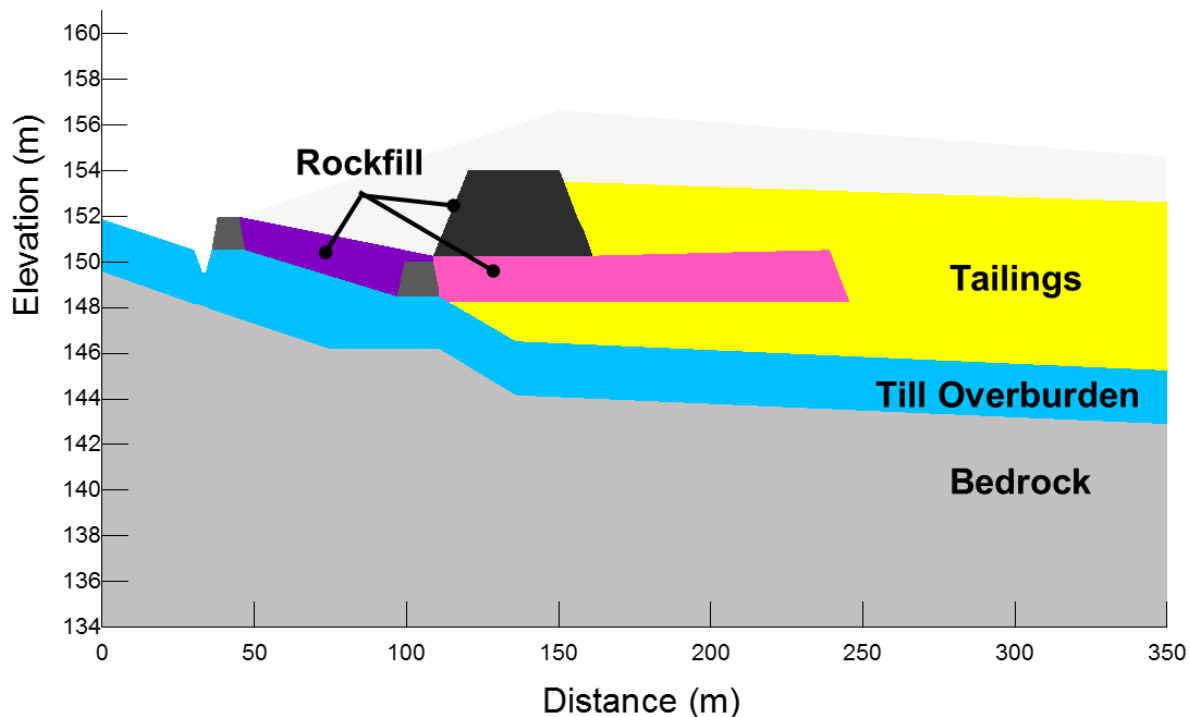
Typical cross section (Cross-Section 4) developed for slope stability analysis
